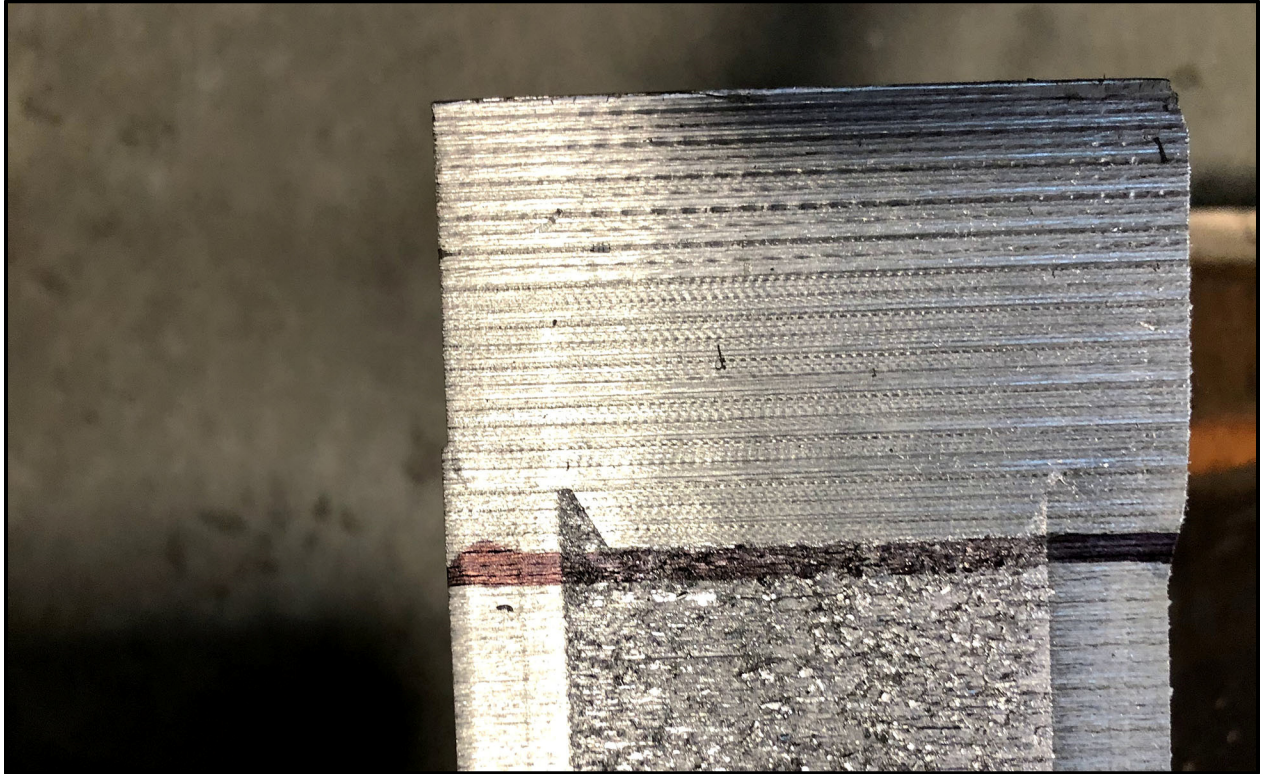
SC-55G2 18TU-10 Destructive Disassembly Cut E/F at Upper Flange
